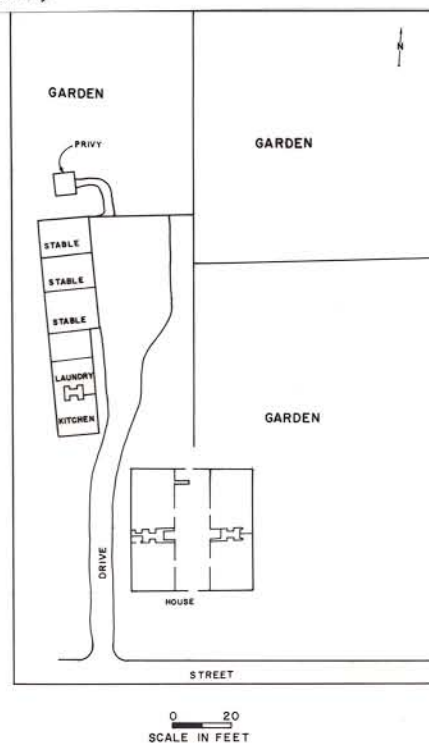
Plan of a Typical Eighteenth Century Town Residence, Charleston, South Carolina. The Structure is the William Gibbes House, Built, ca. 1775. (Source: Architects' Emergency Committee 1970: 40.)
